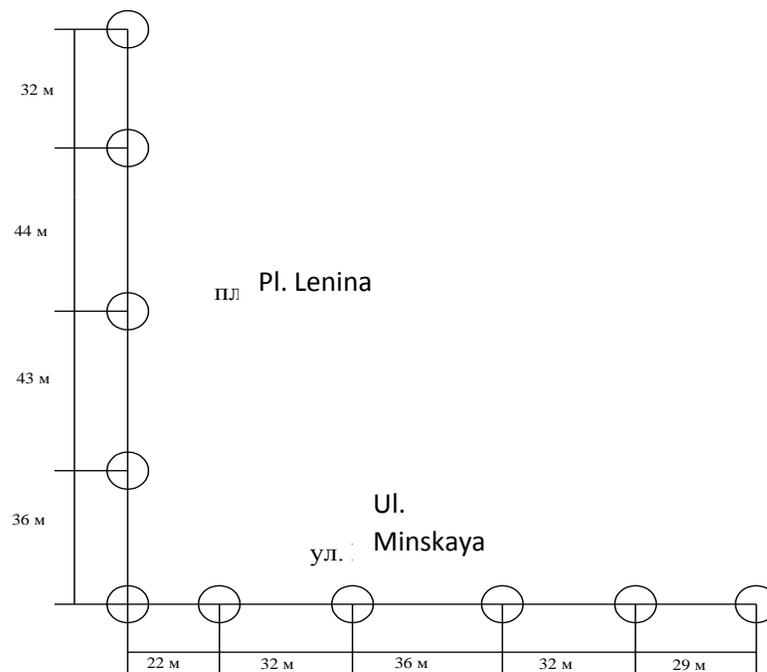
Schematic layout of lighting towers in Ul. Minskaya and Pl. Lenina, City of Novogradok (layout - one-row; luminaire installation altitude - 8.5 m)
